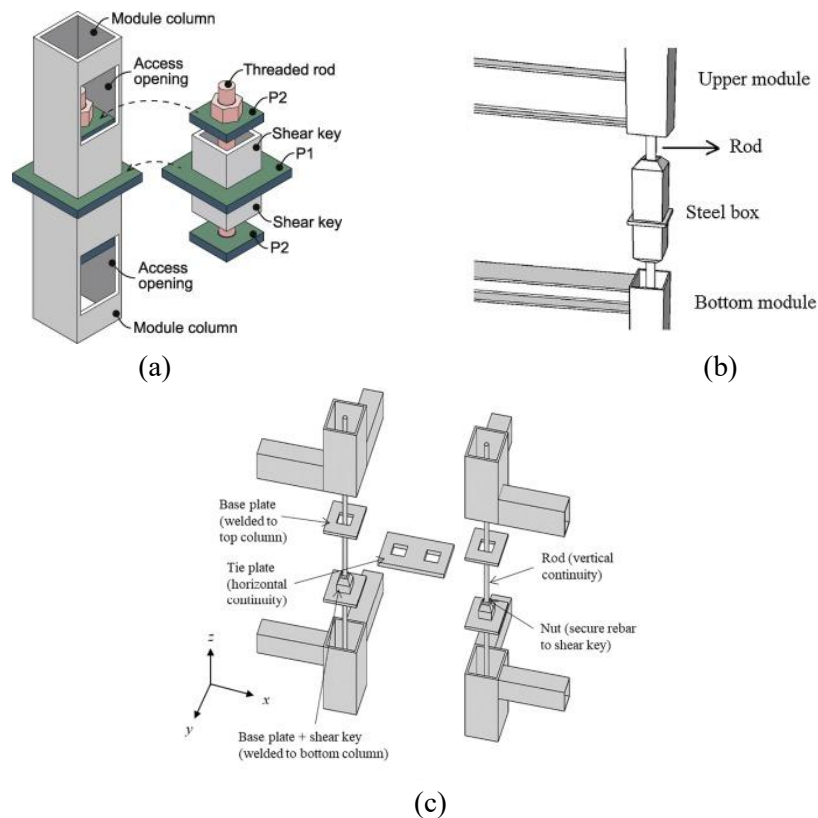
Steel structure inter-module connection model: (a) Proposed post-tensioned vertical inter-module connection detail [11] ; (b) Vertical post- tensioned connection [12]; (c) Post-tensioned rod [15]
